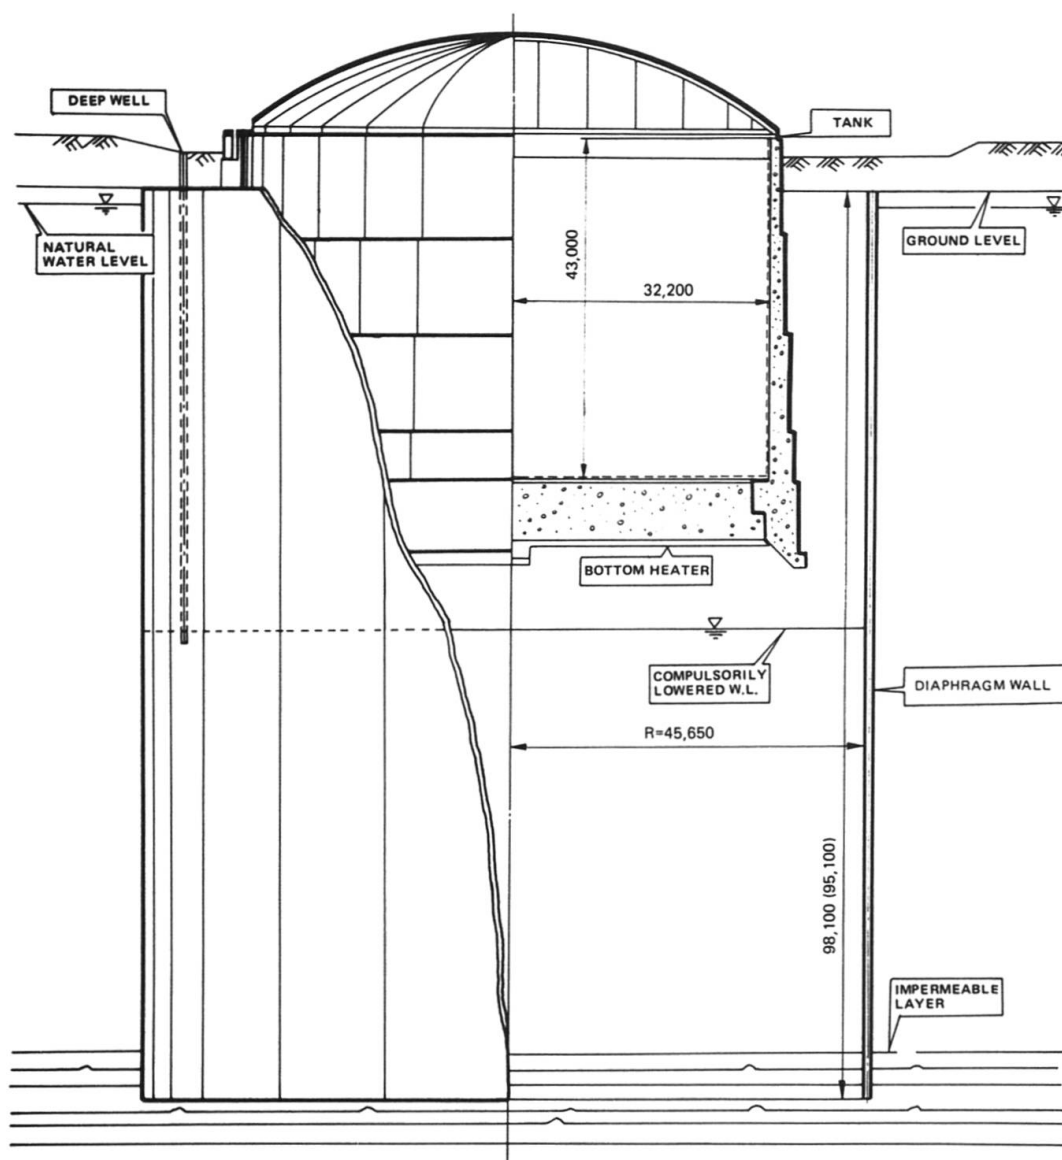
LNG In-ground Storage Tank (130,000 kl)
